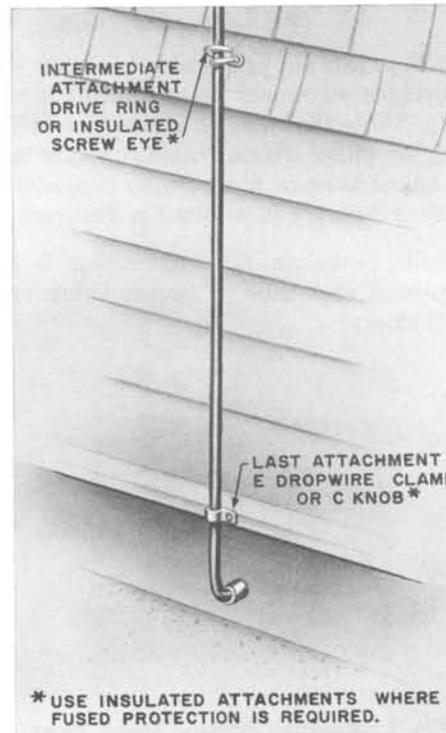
Crossing Wood or Stucco on Wood Building Projection
